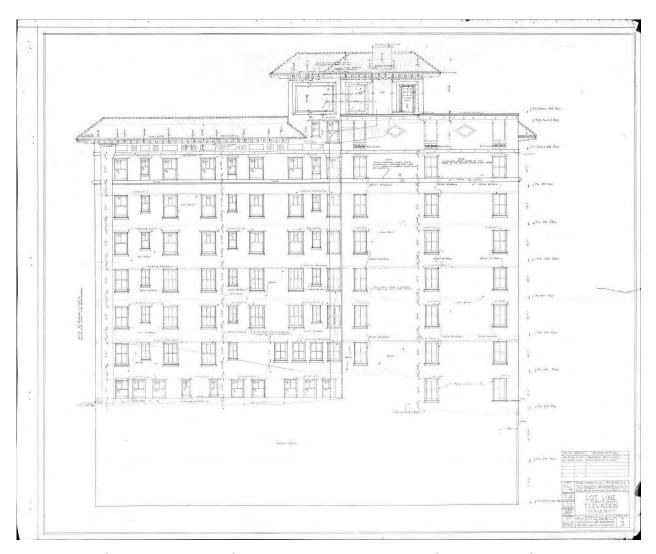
Original drawing of the East Elevation by H. L. Stevens and Company, 1928. From the collection of the building's owner, available in the management office, Park Towers Apartments, Waterloo, Iowa.
